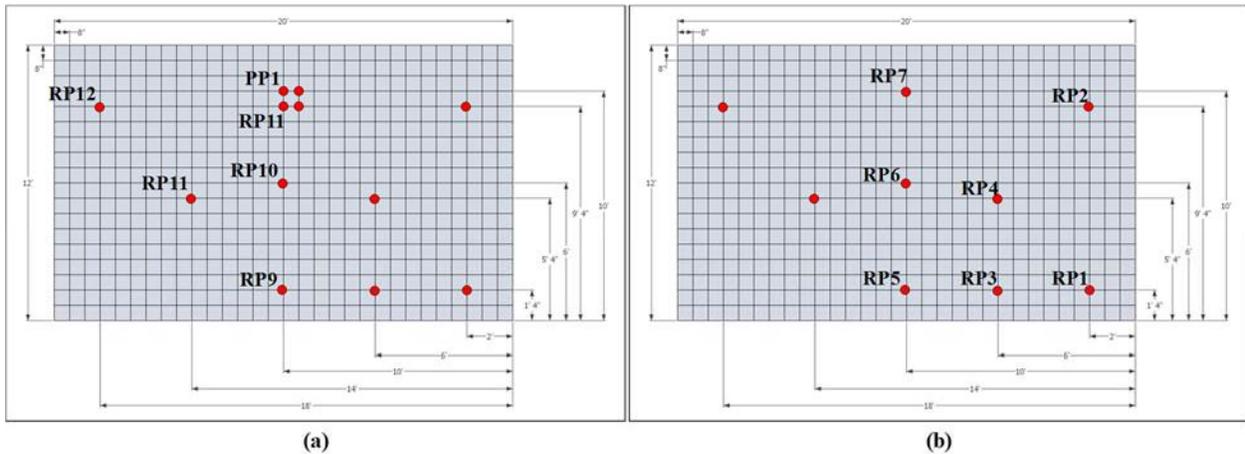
Interior view of reflected pressure gauges; (a) RC Test Wall – rebar couplers and rebar with end plates; (b) RC Baseline Wall –conventional reinforcement
